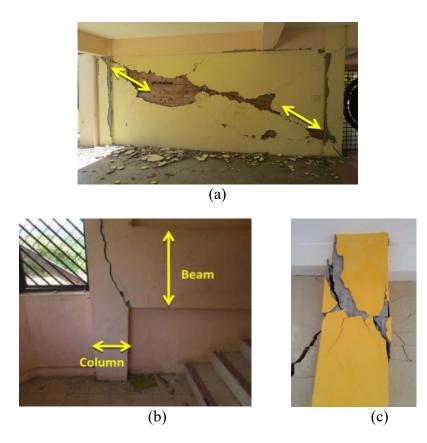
Damage to the building after 2015 Ranau earthquake showing (a) crack on the wall (b) cracks at beam-column joint and (c) shear failure on column (Alih and Vafaei, 2019)
